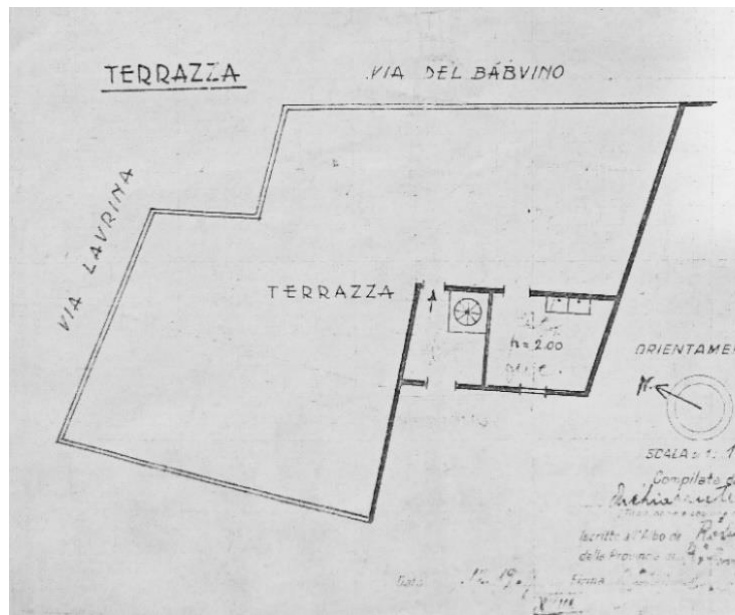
Former plan of the terrace floor, Accardi's house, Rome.
